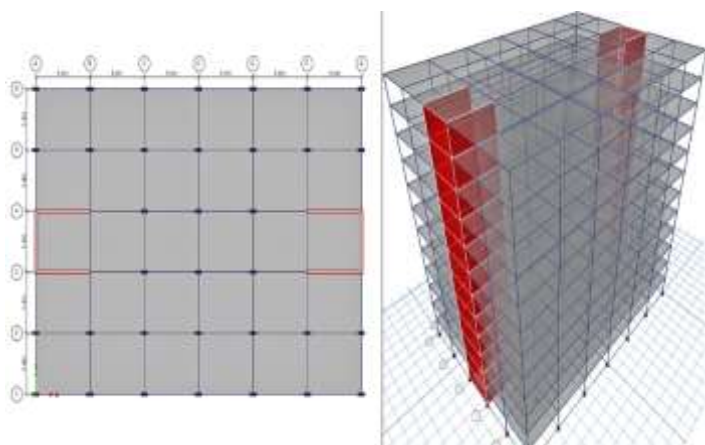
R.C.C Model for M3 Shear Wall Position
